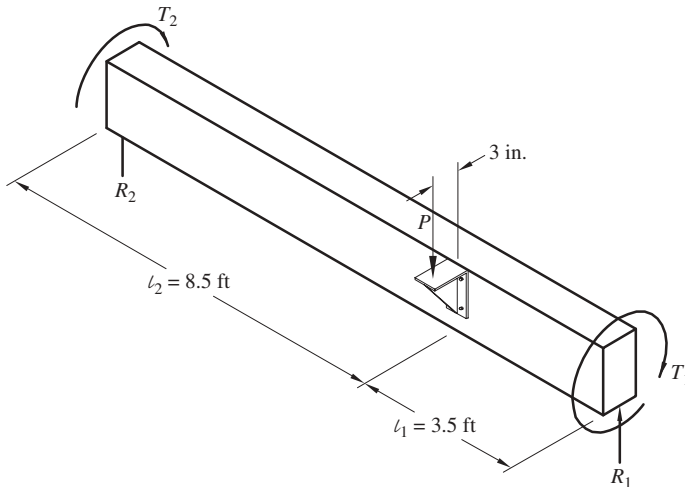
Beam subject to torsion—Example 4.6-1.
